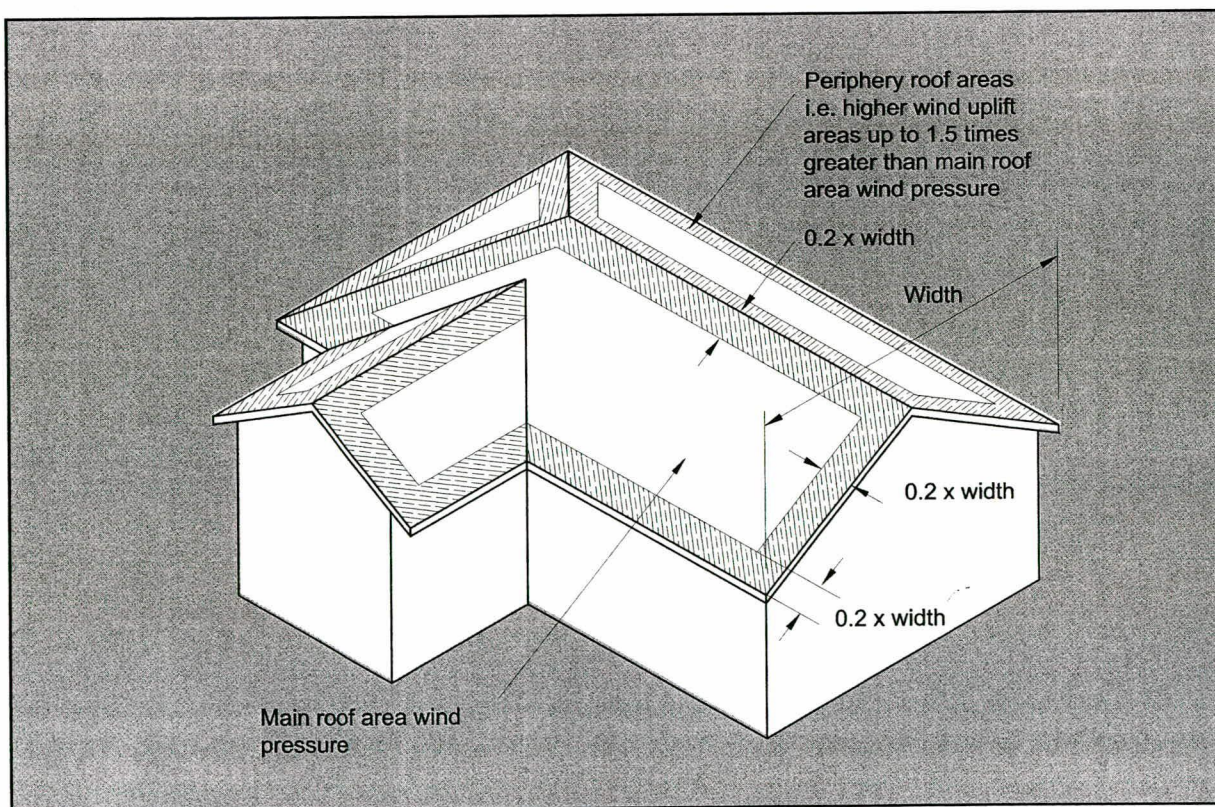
Hip and valley roof showing higher wind uplift areas requiring extra purlin and batten fixings (see table 10.9)
